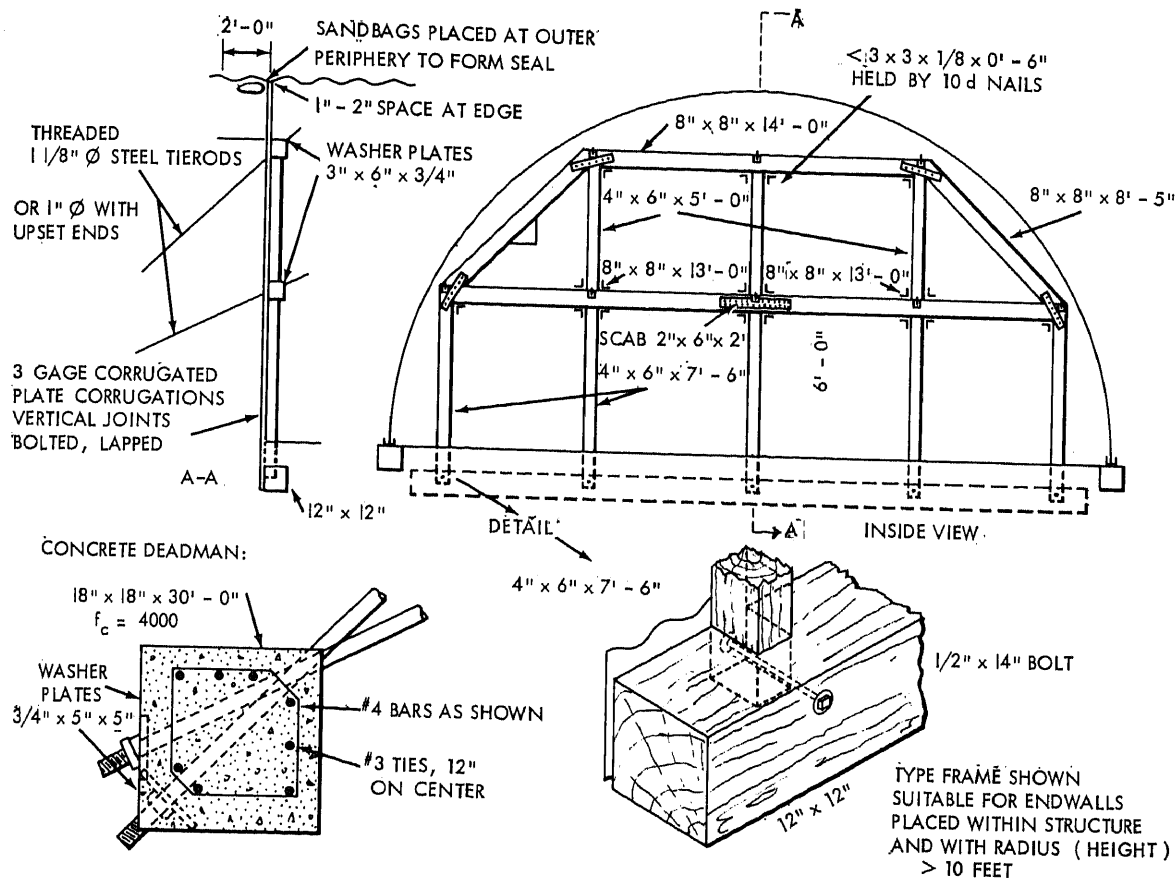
Framing plan of timber-framed corrugated steel endwall suitable for 50 psi. Shown with 15-foot-radius structure.
